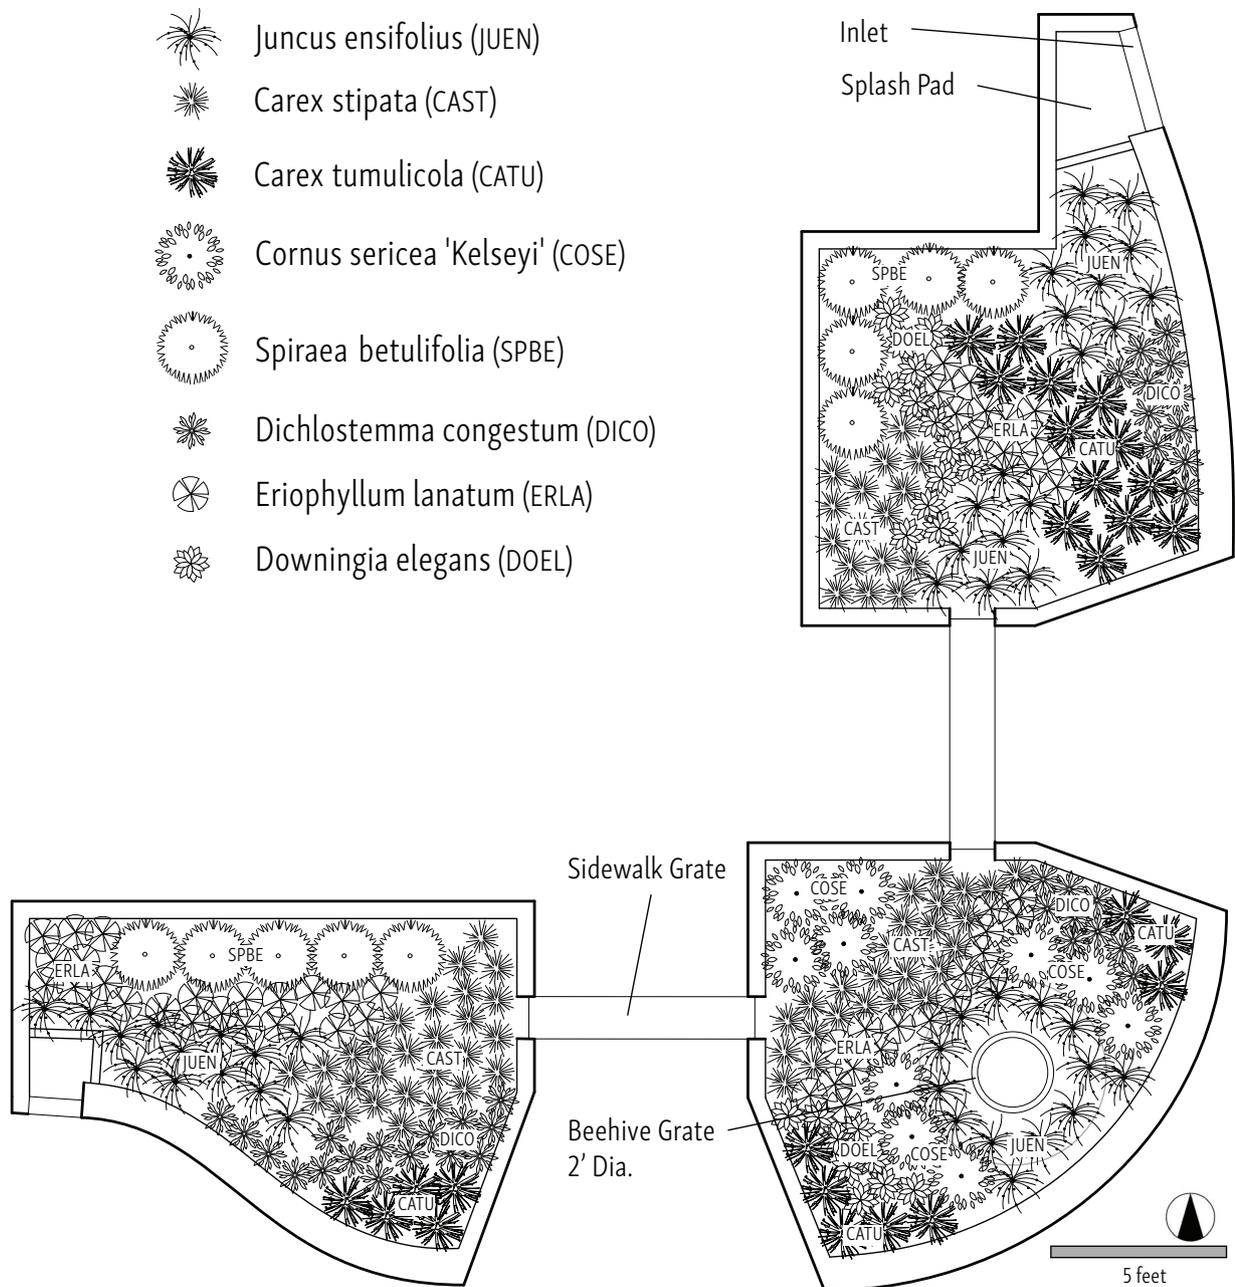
Strategy “Diversify Zone A” planting plan, NW corner
